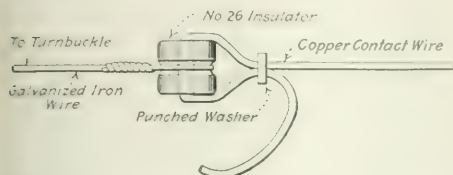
NO. 26 KNOB USED AS A STRAIN INSULATOR
